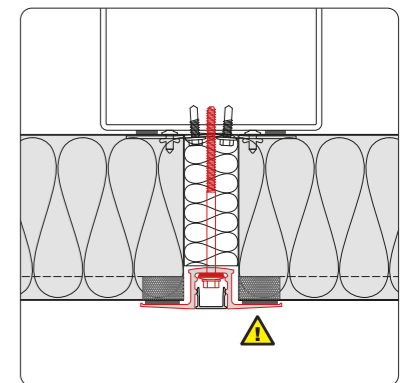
Fastening principle B, fixing with HF 102 Aluminium profile.
